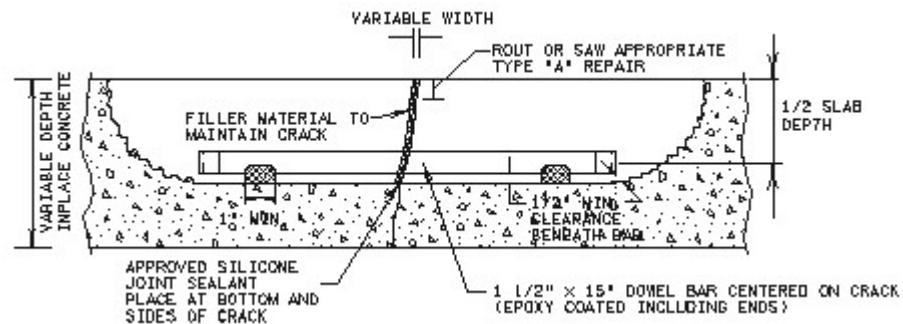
Typical Elevation View of Retrofit Dowel Installation [3]
